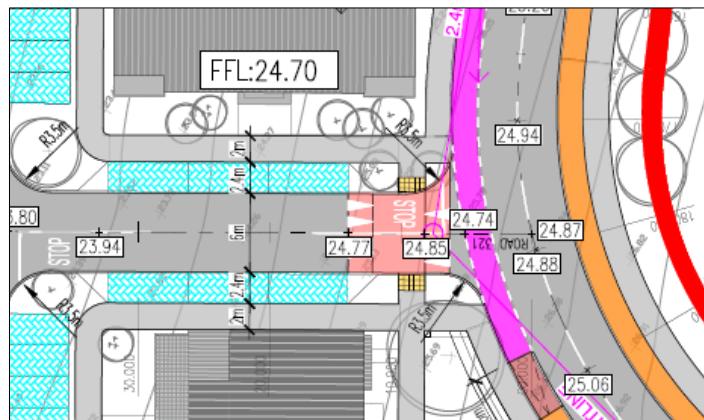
Extract of Road Layout Plan Showing Flat Top Pedestrian Crossing
